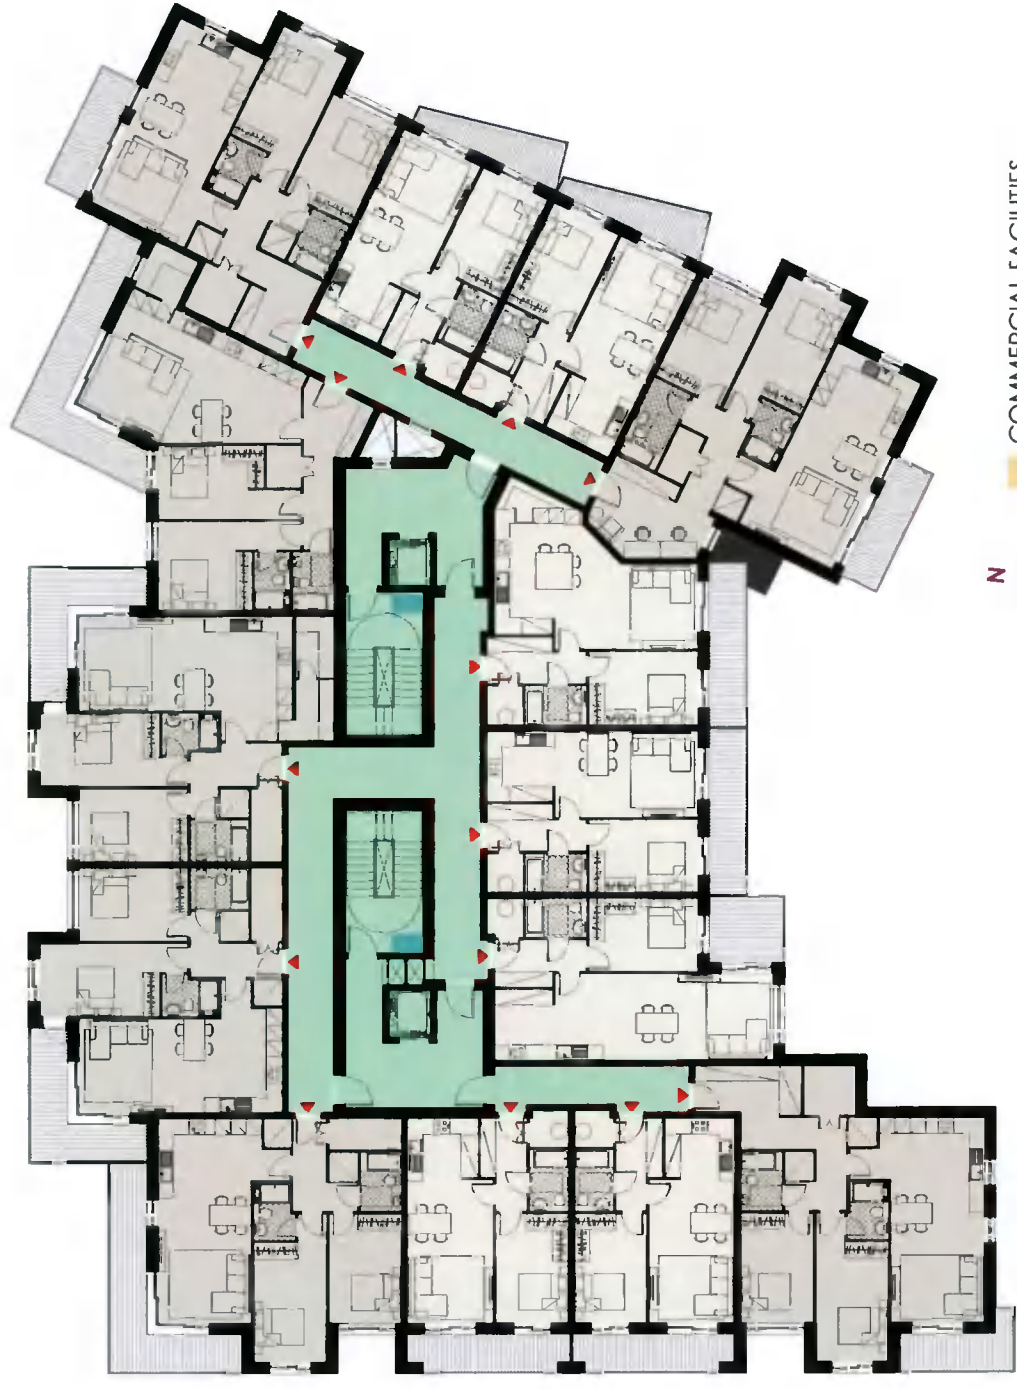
d & 3rd Floor Plans - Typical Floor Plan - Not to Scale
